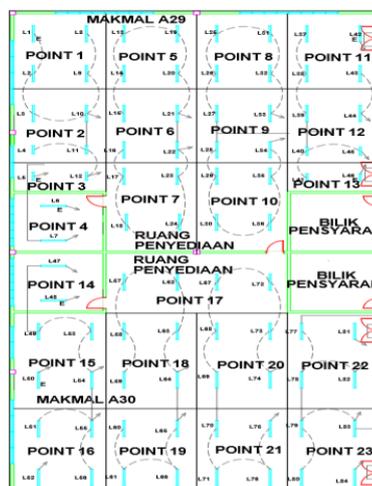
Example of a floor plan with 23 grid points for illuminance measurement. Note that each floor in the building has the same layout plan.
